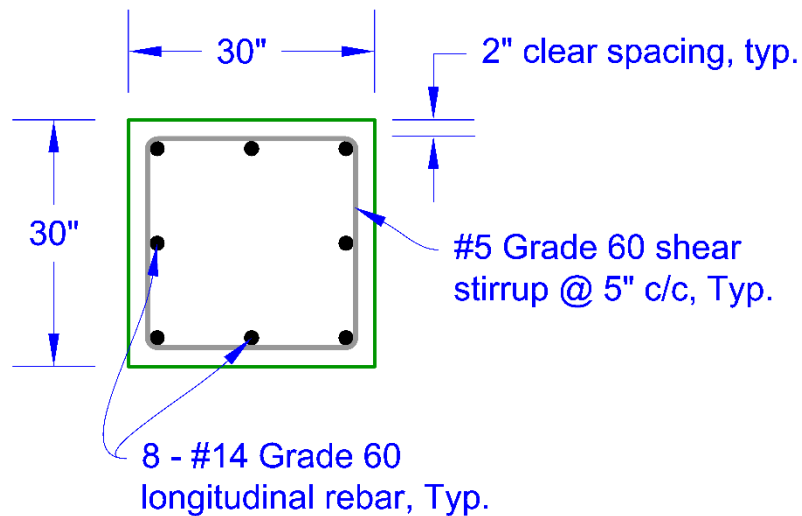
Cross section view of the columns showing the rebar arrangement in the columns.
